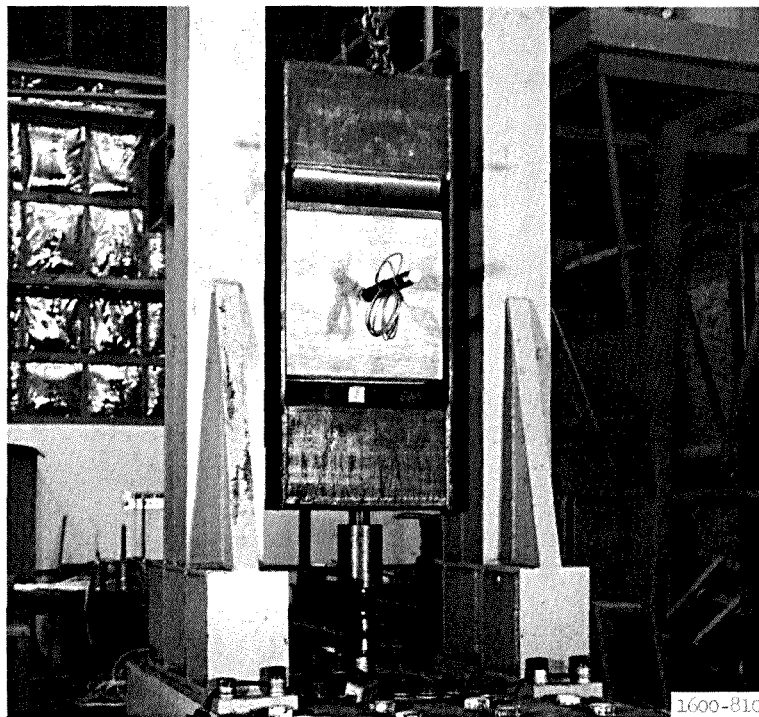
Pretest view of completed Cadweld-spliced sample.
